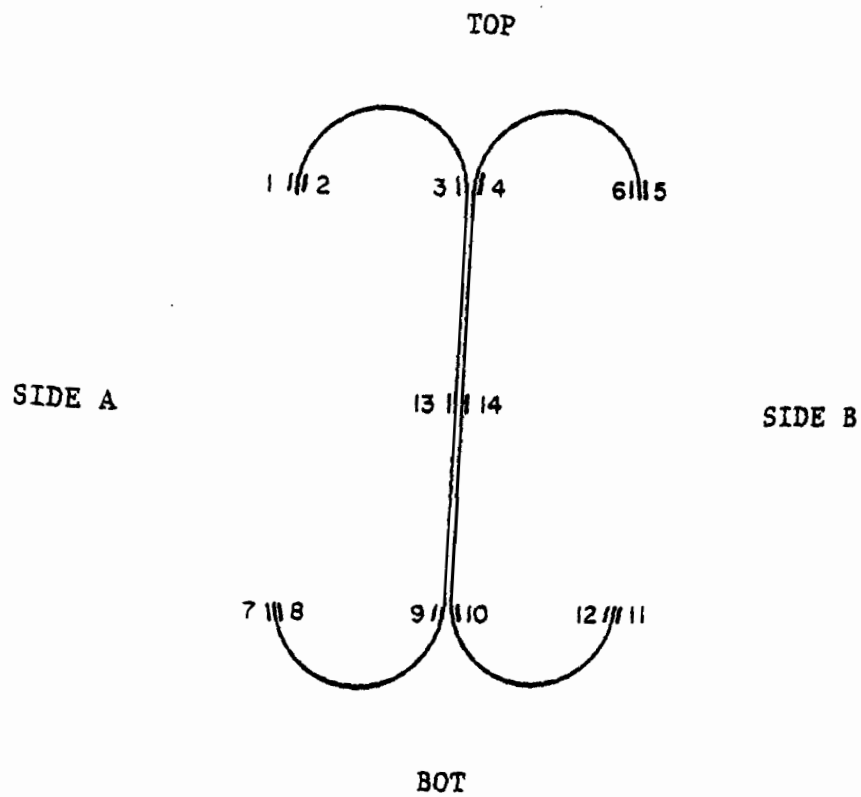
Location of Strain Gages on Stub Column Specimens
